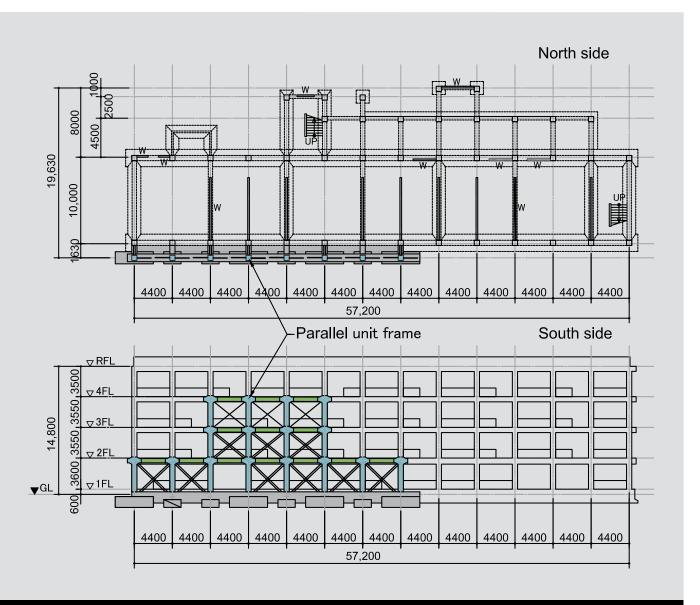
Junior high school building retrofitted by parallel unit frame method. Plan of the first floor and elevation. Note: All measurements are in millimeters. W = installed reinforced shear wall. 1 mm = 0.0394 in.
